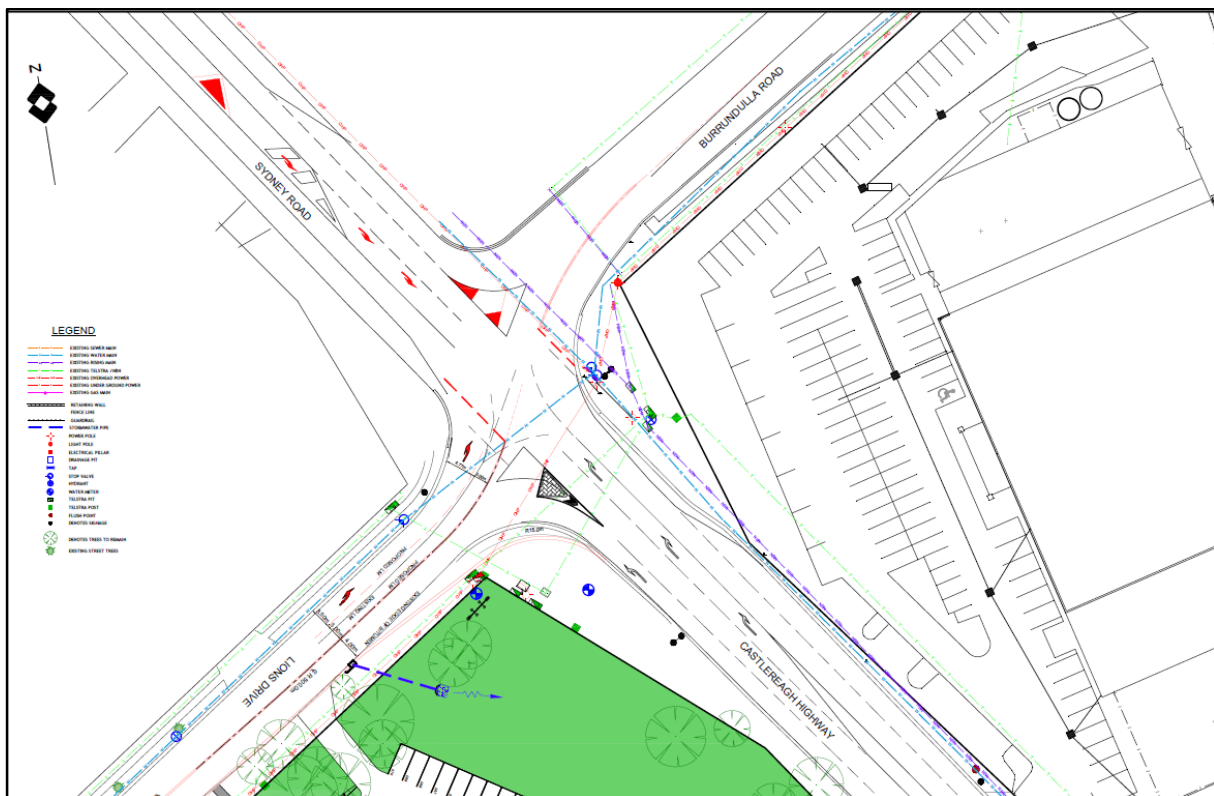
Extract from Civil Plans showing proposed upgrades to intersection of Castlereagh Highway and Lions Drive.
